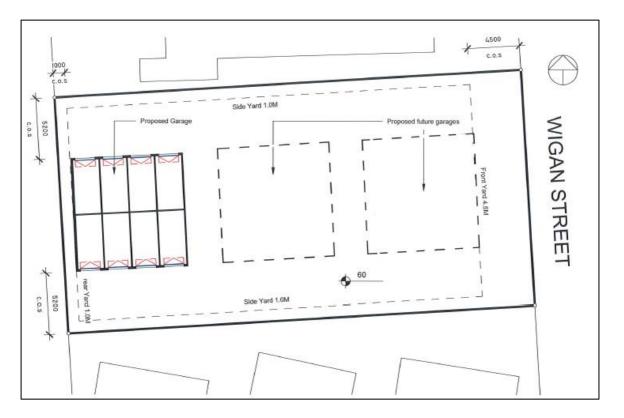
Extract of the proposed Site Plan (source: Sheet number A1.0, dated 30/05/2023)
